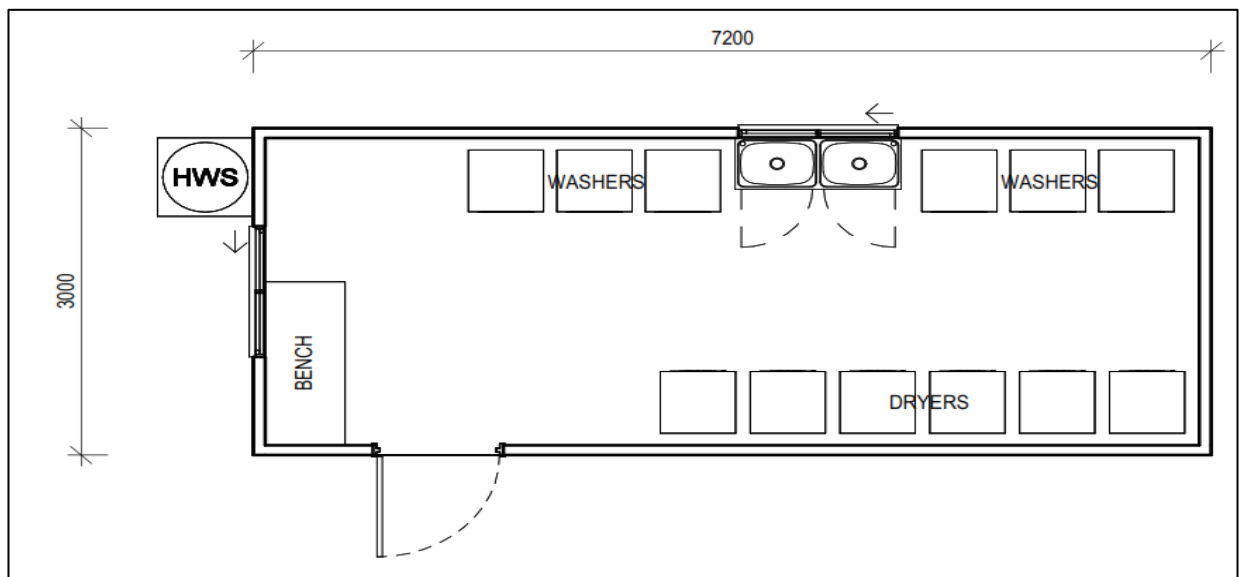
Laundry Module Floor Plans (Source: The Design House NQ, 2026)
